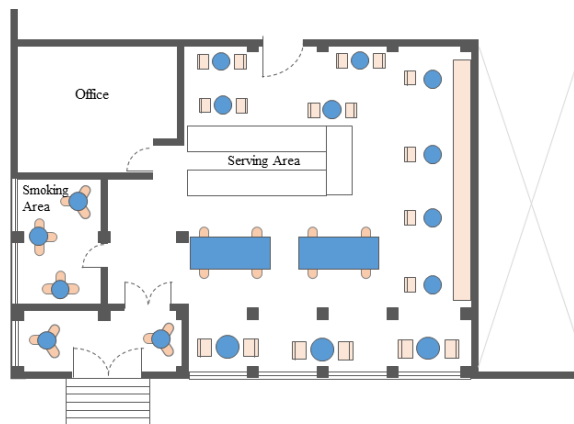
The floor plan of Starbucks Filateli Building in 2020.
